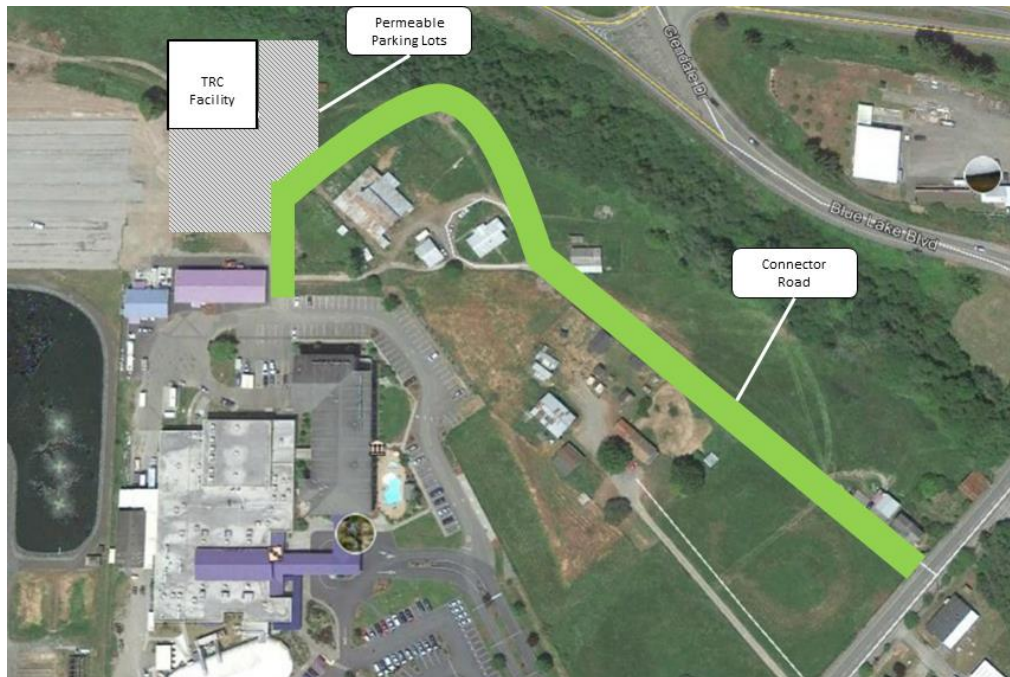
Originally proposed Toma Facility, Parking, and Road Location
